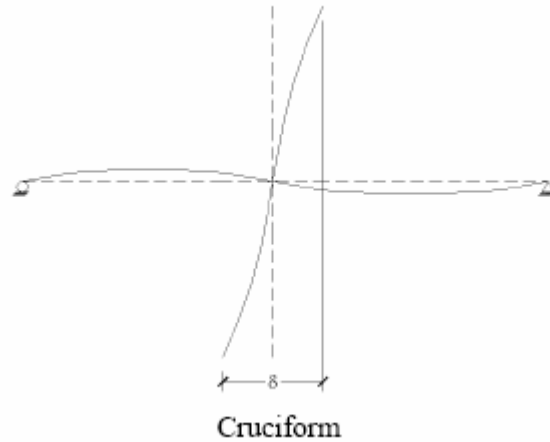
Typical deflected shape of cruciform sub-assembly
